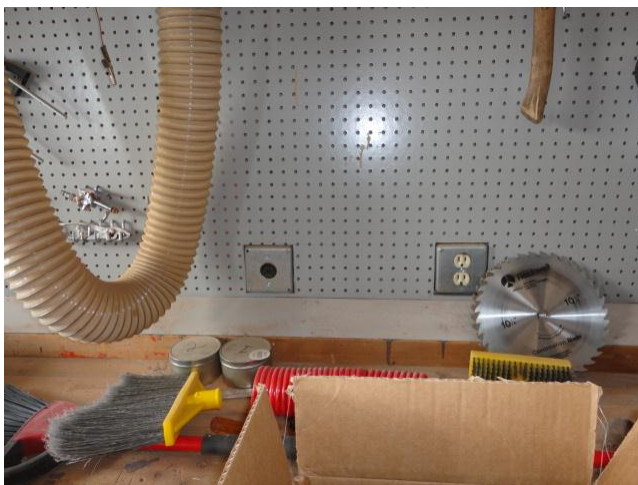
Carpenter Shop – One of approximately 6 existing 110V outlets that shall be converted to GFCI. Outlets and conduit are all surface mounted to CMU walls as shown. Install GFCI Breakers in existing panel or install GFCI outlets as code requires.
